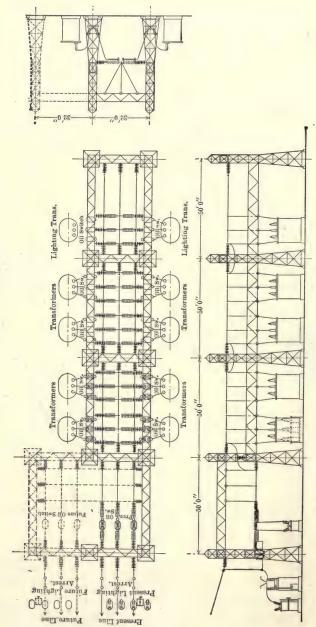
Arrangement of Outdoor Transformer and Switching Station.
